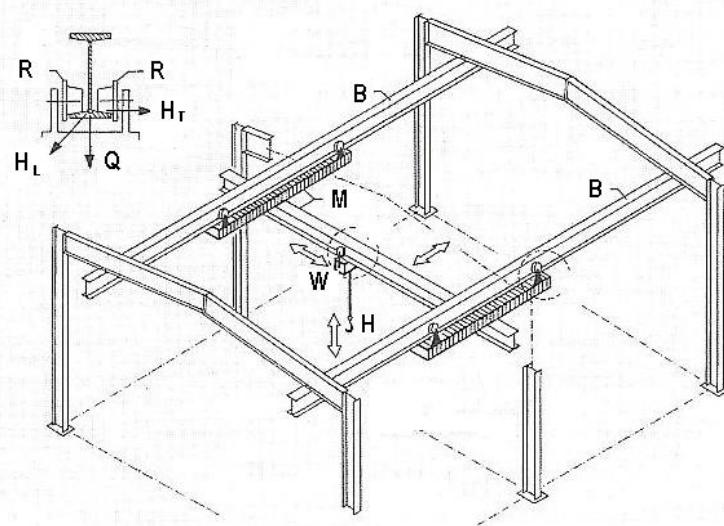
Isometric view on single girder underhung crane: B-runway beam, M-crane bridge, W-trolley, H-hook, R-crane wheel
